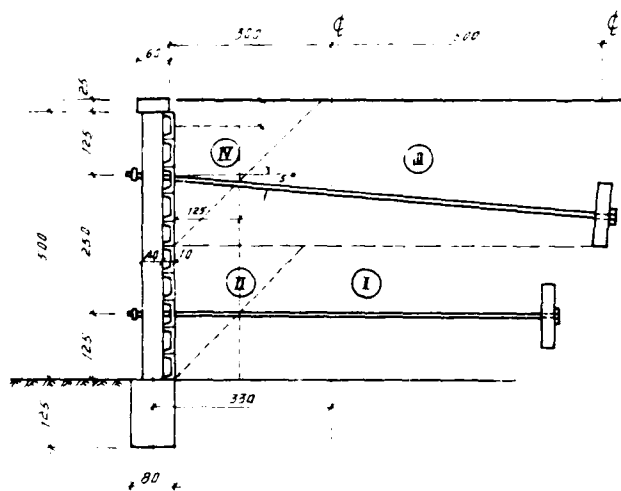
The Section of Ba-Yu-Quan Anchor Slab Retaining Wall
